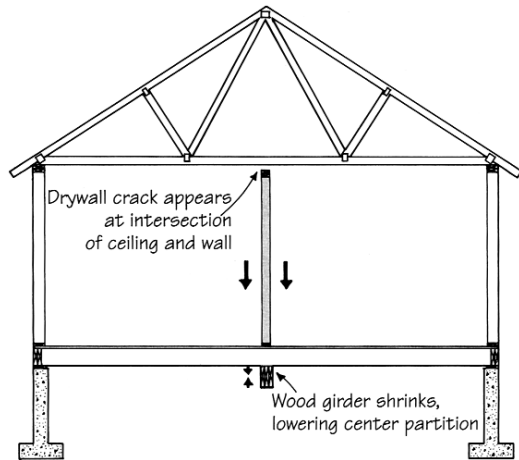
Drywall cracks at the ceiling can open up when the basement girder shrinks and pulls the partition downward. The only fix is to install crown molding over the crack. Attach the molding to the ceiling but not to the wall.
